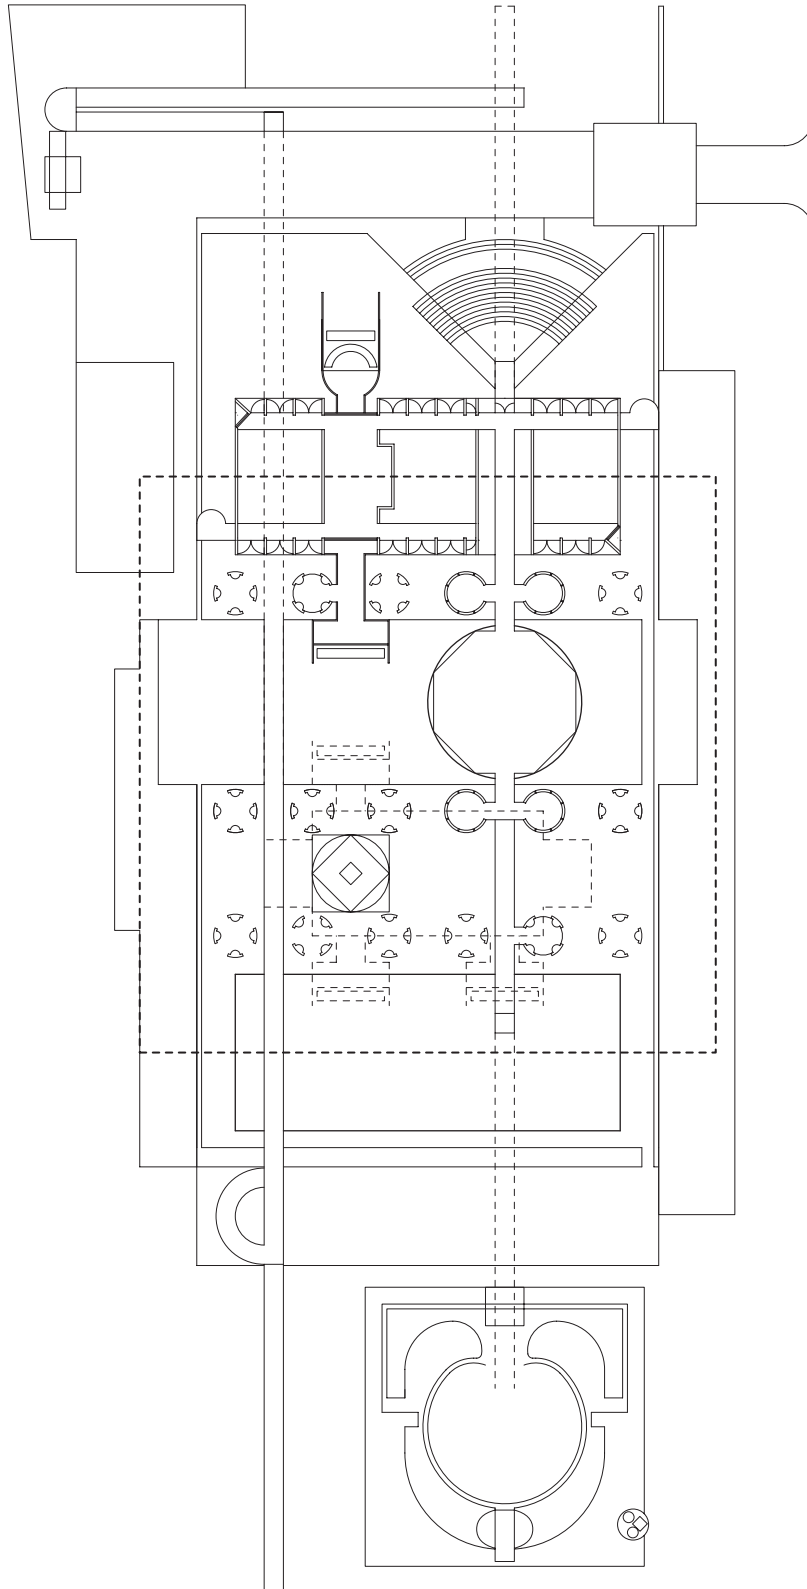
Piano nobile plan of Entelechy II (with overall site plan below).
